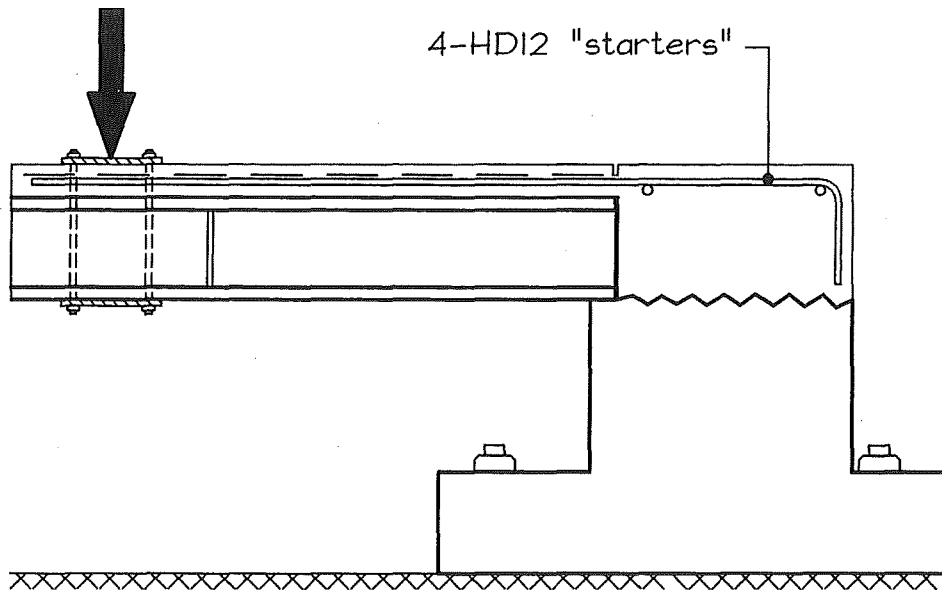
Configuration of CANTI-1 test involving a typical starter/continuity bar detail
